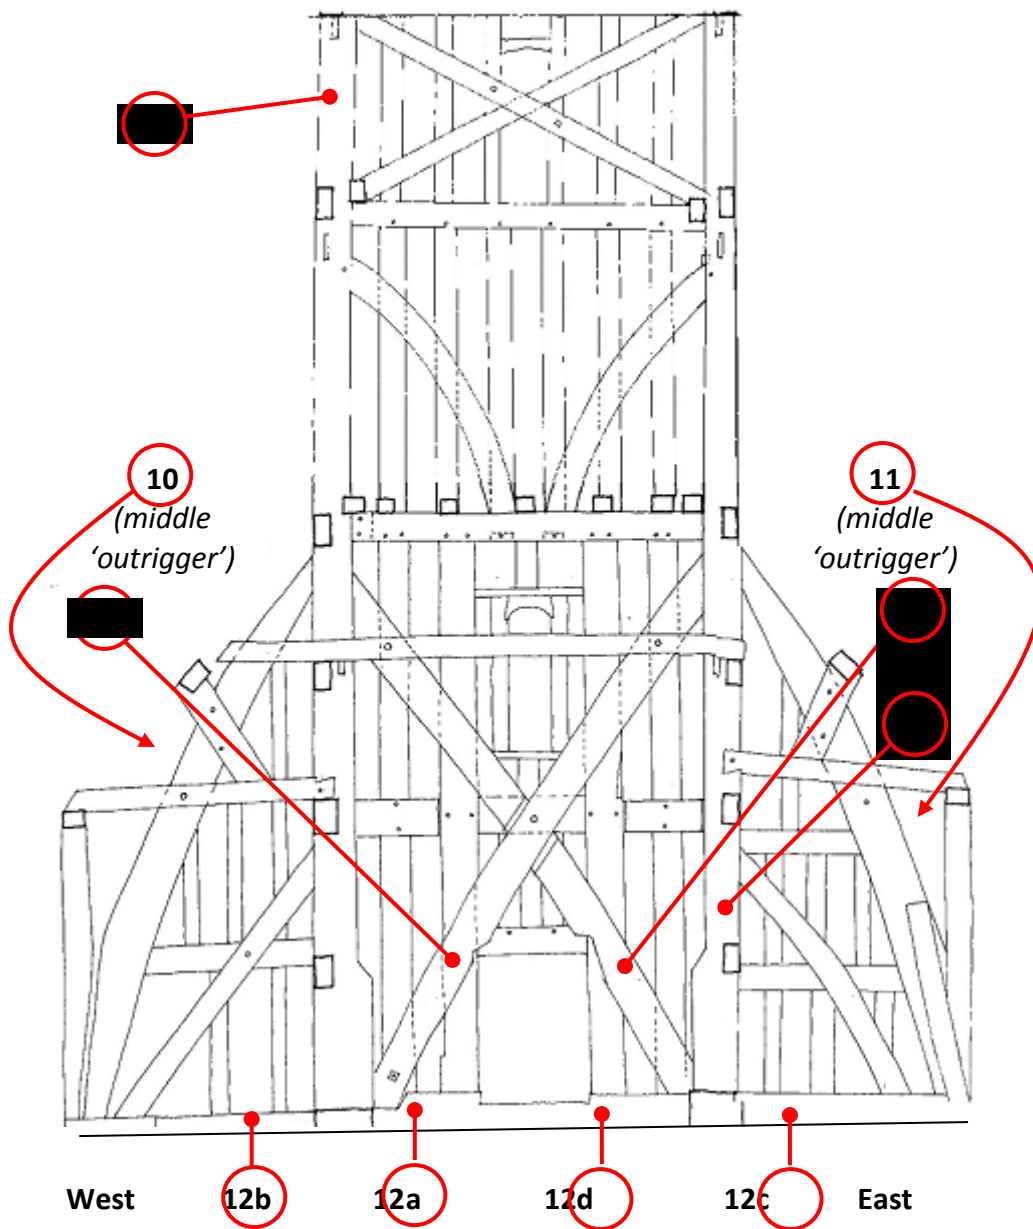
Section looking north to locate sampled timbers (after Nick Joyce Architects)
